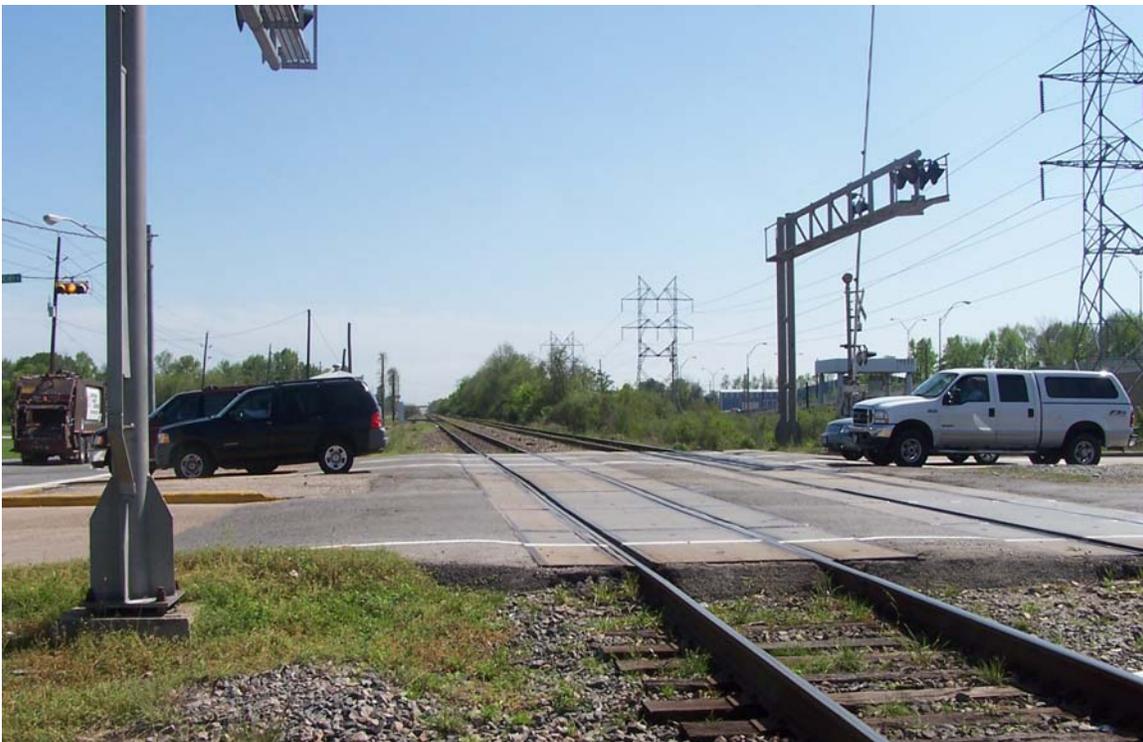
Palestine Subdivision at Richey Road (looking south)
